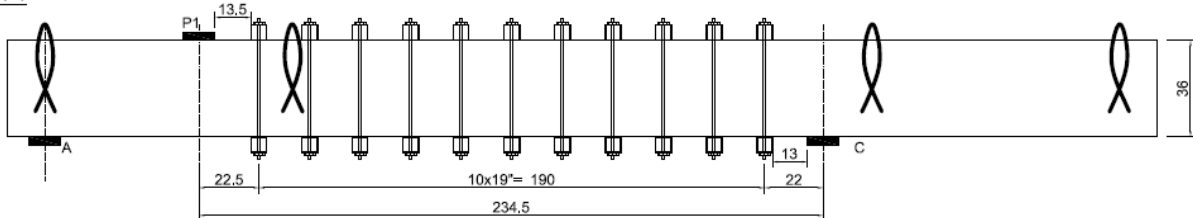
Beam 2 Test 1 Configuration (dimensions in inches).
